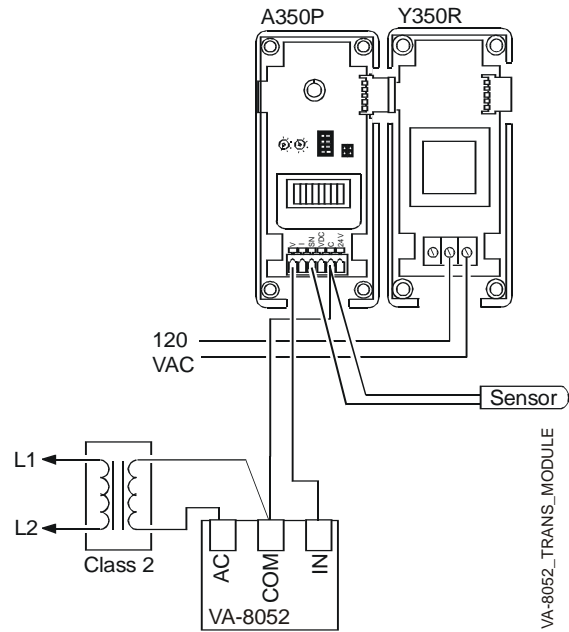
Wiring an A350P Controller and Y350 Power Module to a VA-8052 Valve Actuator with a Separate Power Supply Transformer
